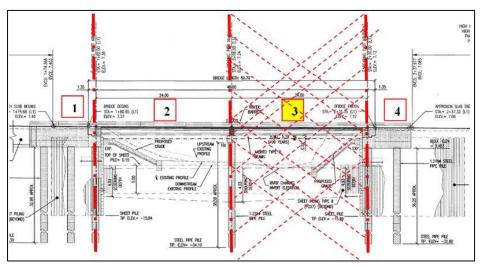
C-Bridge Plan – Guayanilla Bridge 1496
